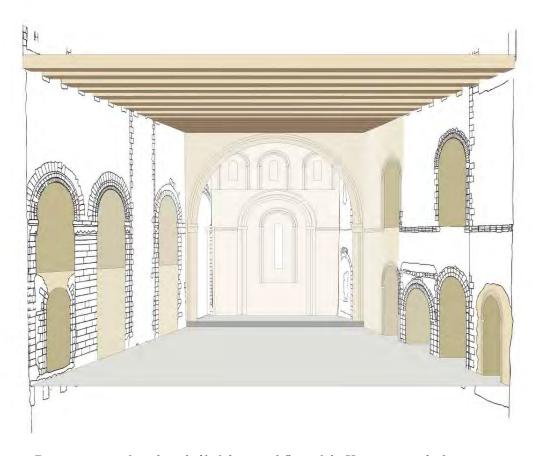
Reconstruction of southern half of the second floor of the Keep interior, looking east
